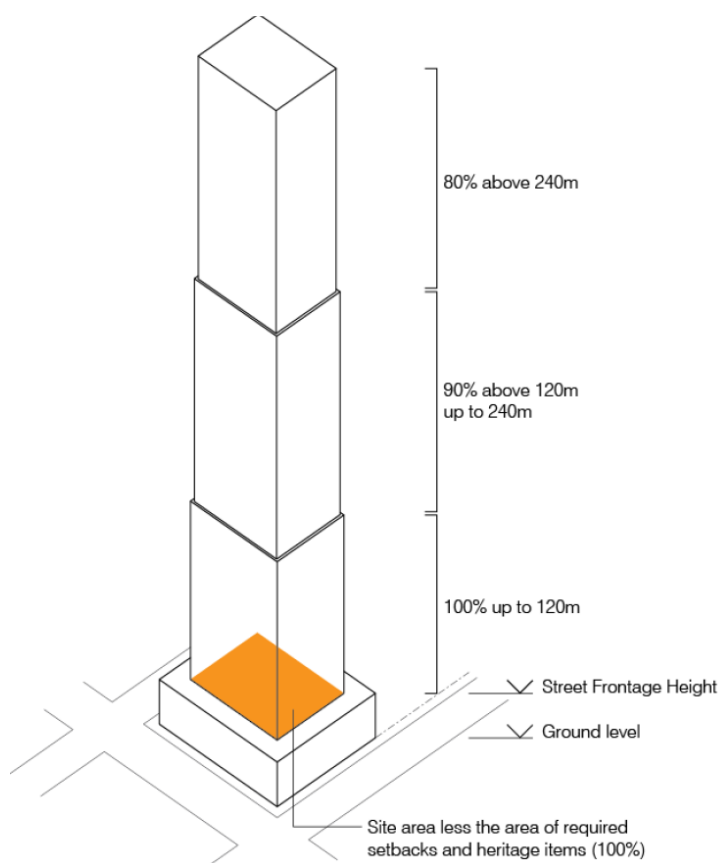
Figure 5.19 'Maximum Building Envelope Area above Street Frontage Height'
